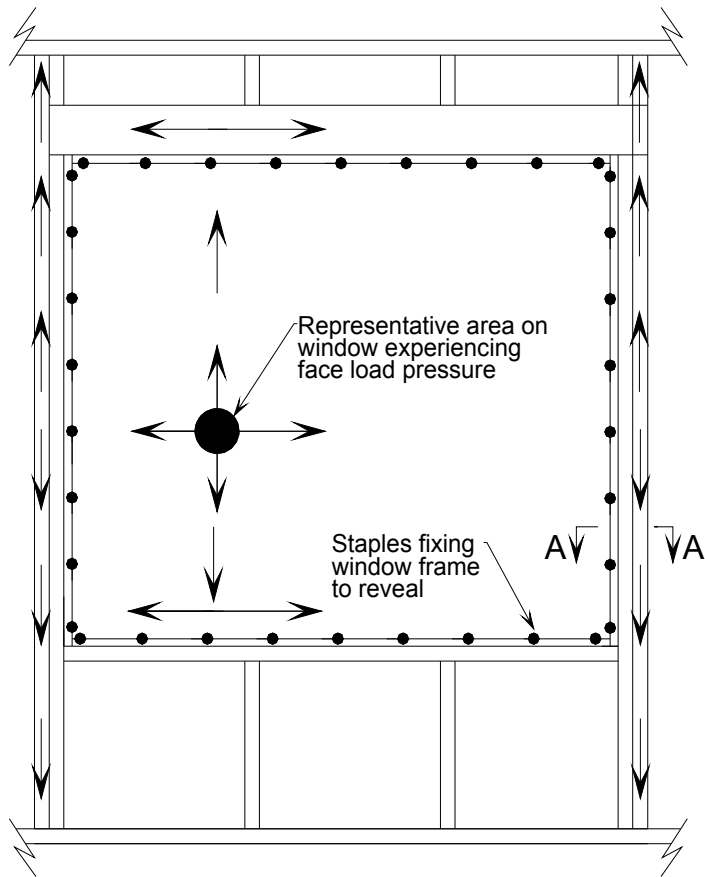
(b) illustrates how the wind face-load “suction” forces on glazing are transferred to the wall top and bottom plate. These forces will then be directly or indirectly transferred to the foundations, such as via floor and ceiling diaphragms and bracing walls parallel to the wind forces.
